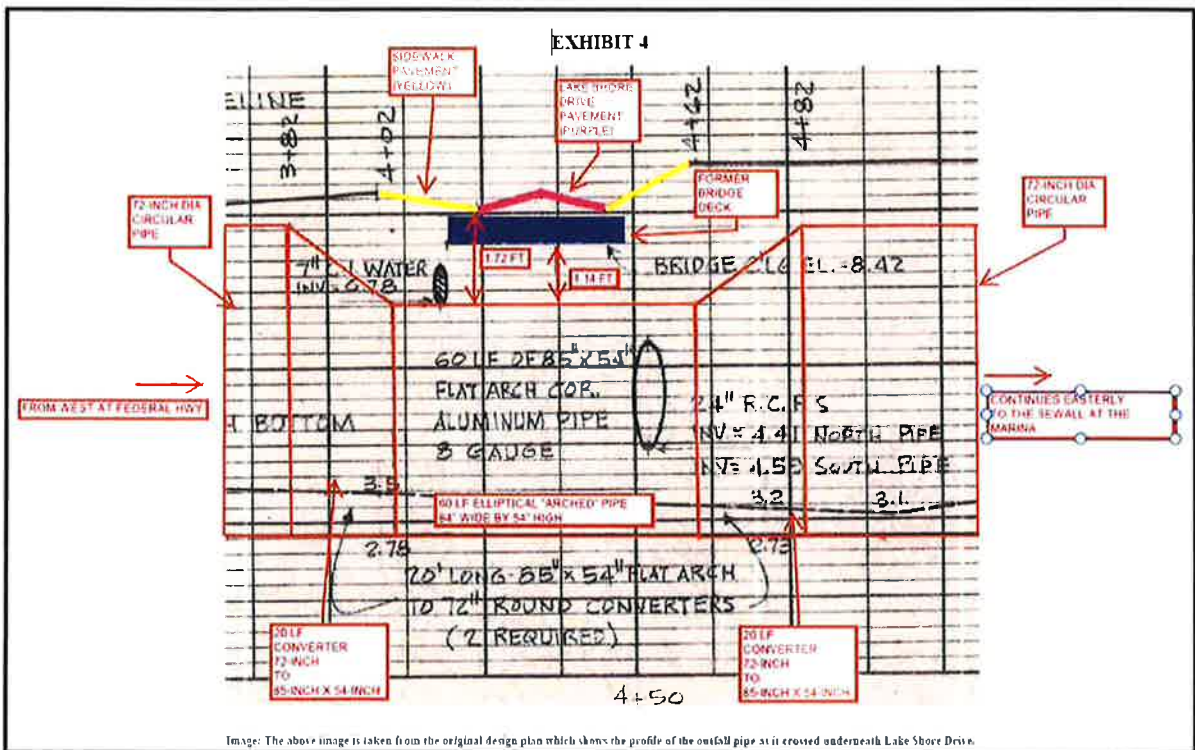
Round to Arch and Arch to Round Transitions at Lake Shore Drive Bridge Crossing
